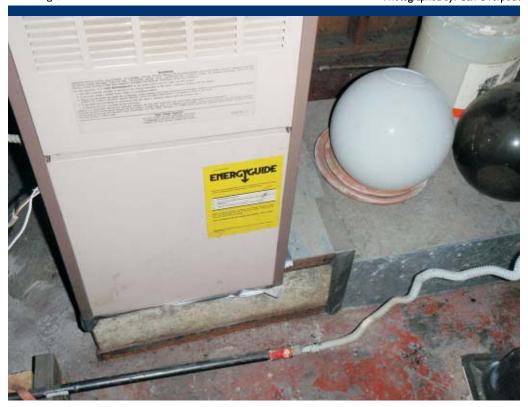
Furnace in utility room. Note steel pipe-to-plastic gas line, and wiring to left.
